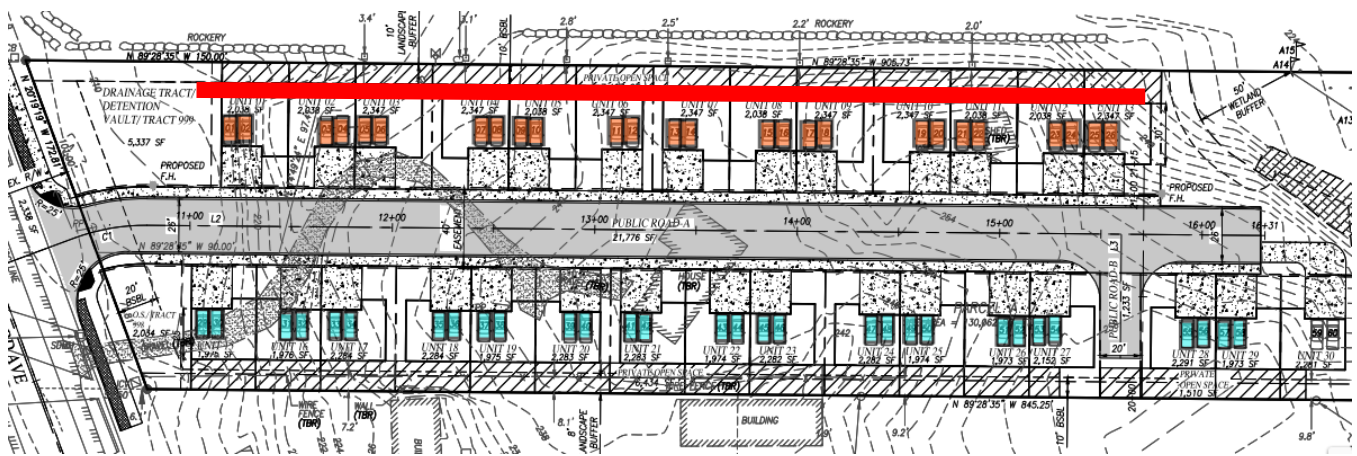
Bickford Townhomes Horizontal Barrier Extent Recommendations
